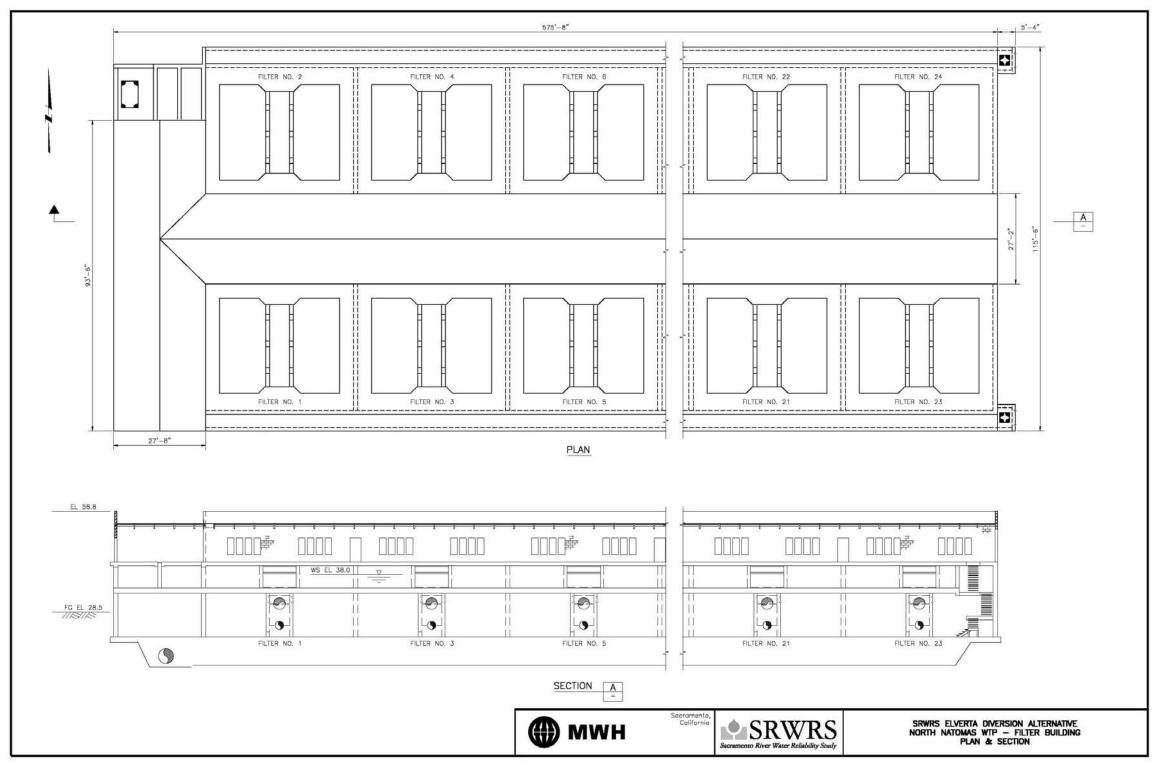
North Natomas WTP – Filter Building Plan and Section
